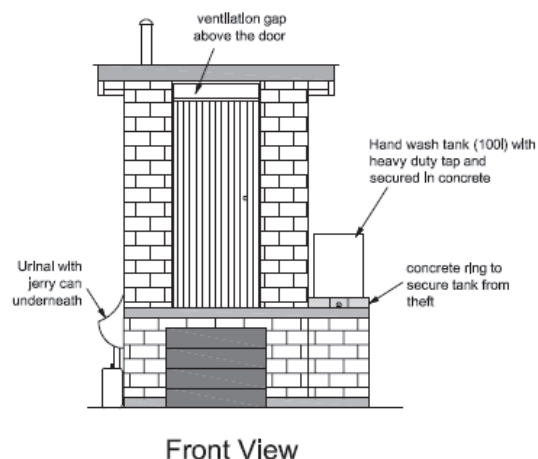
Design drawings of UDDT (for website link of drawings see Section 13)
